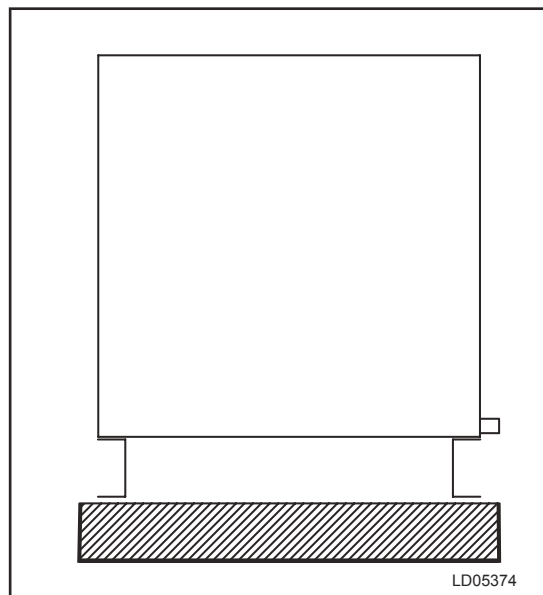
WITH EXTENDED BASE RAIL AND HOUSEKEEPING PAD
